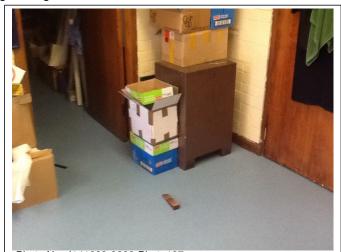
Photo107 Result: Asbestos - Presumed Positive Building/Level: Building 4-Level Two Room/Location: 4R3017 (Art)-Various Throughout Feature/Material: Heater-Insulation
